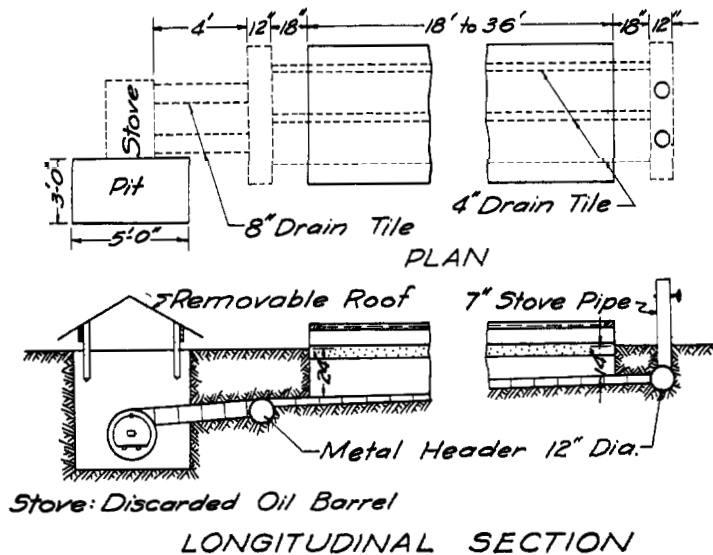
Plan and longitudinal section of a flue-heated hotbed showing oil barrel, stove, and sheet iron headers.
